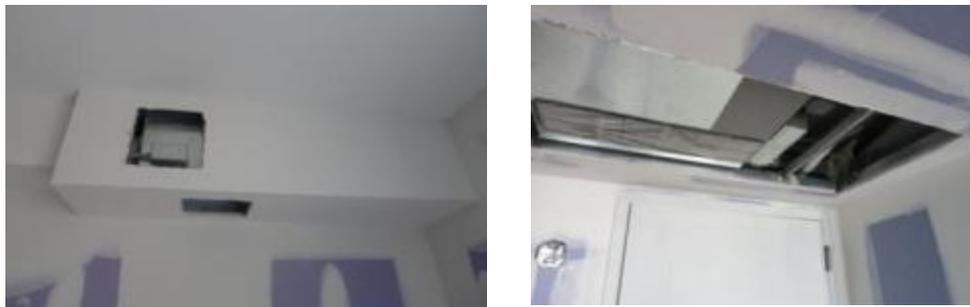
Living room soffit open cavity (L); open plenum near entryway and kitchen walls (R)
